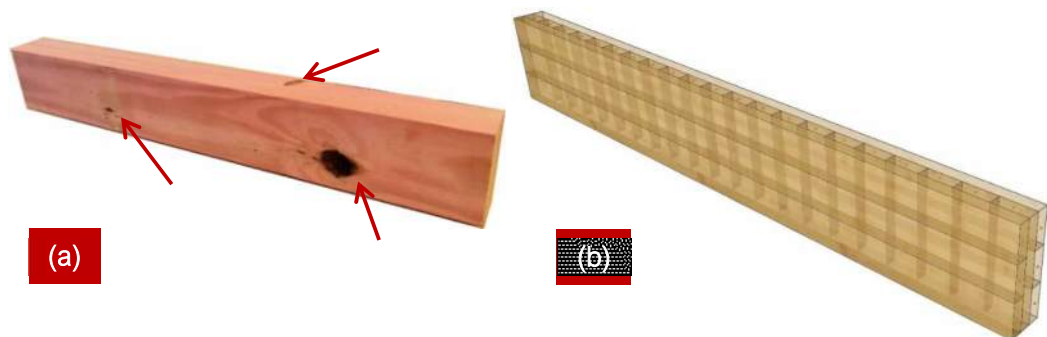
Structural timber beam versus CLT beam; a) Structural timber beam with common defects; b) CLT beam.
